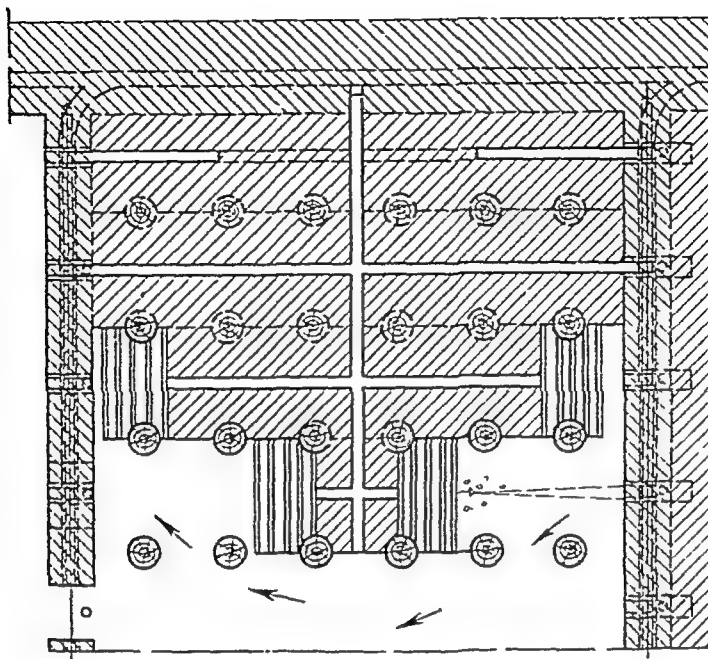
Ventilation layout for mining by open stopes leaving regular ore pillars
